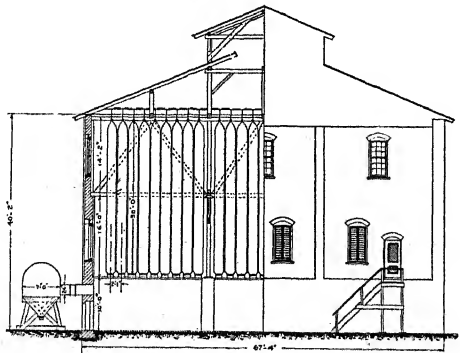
SECTIONAL END ELEVATION OF BAG HOUSE.
